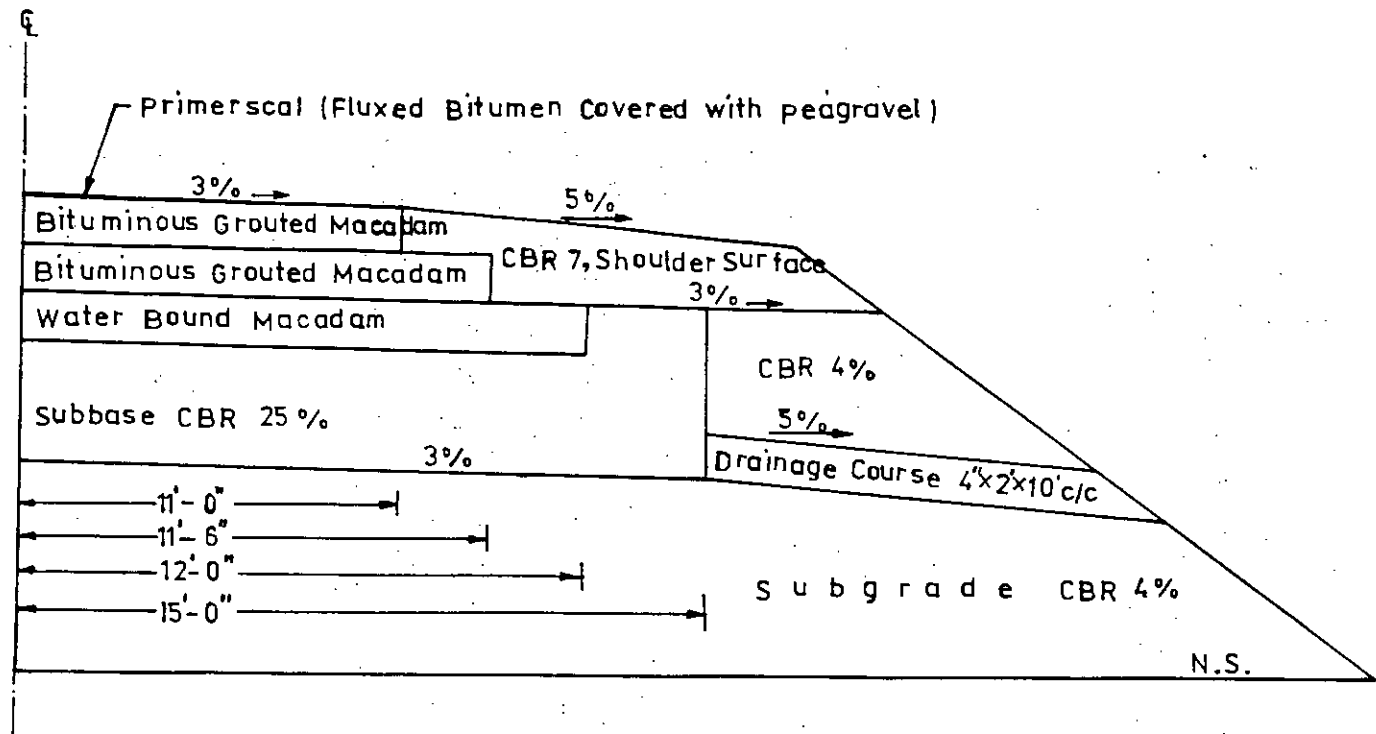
PAVEMENT SECTION FOR LAST 12.74 MILES
